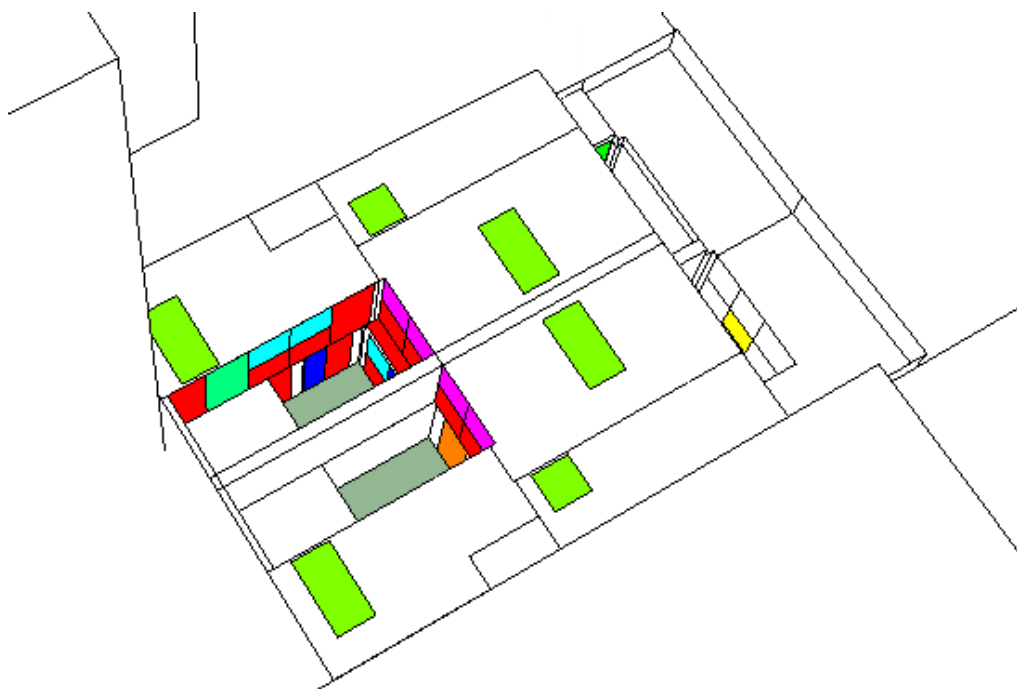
Rear Elevation Light Wells Window Openings – (South)
